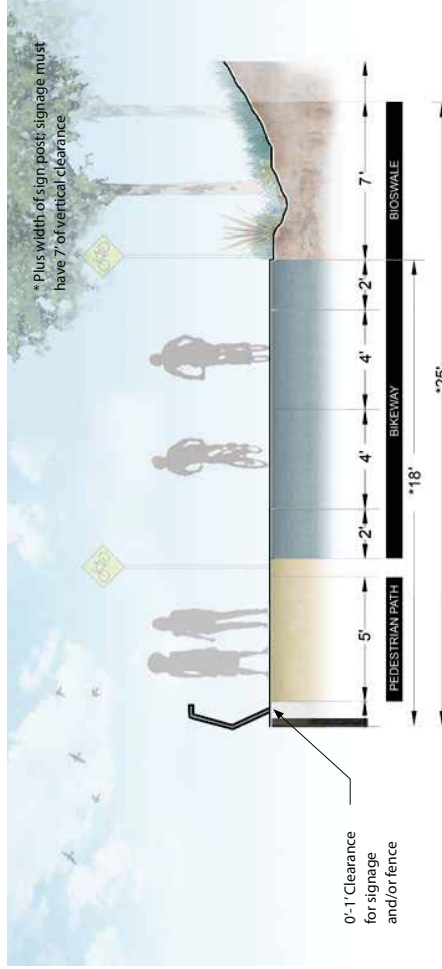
Weddington Park to Lankershim Boulevard - Typical Cross Section
